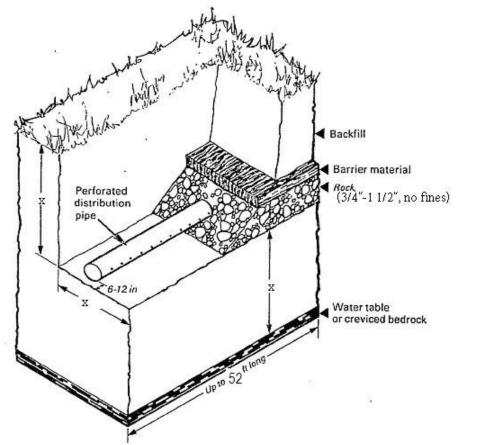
Typical Trench Construction (dimensions per Table V, 2401-13-20)
